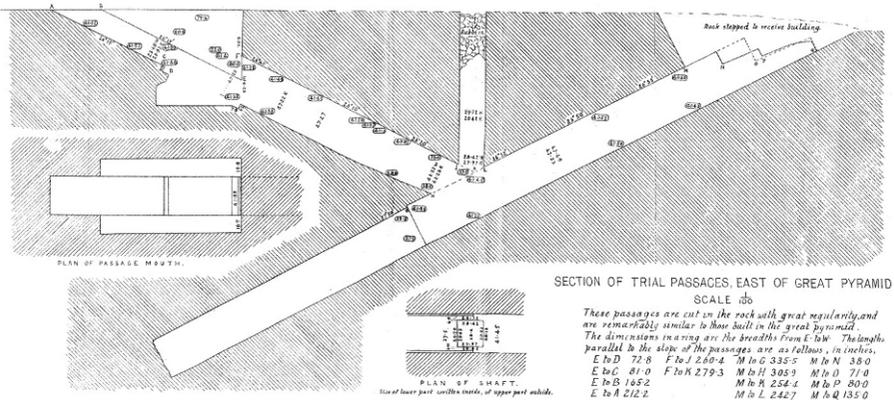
Section and plan of the "Trial Passages" according to Petrie
